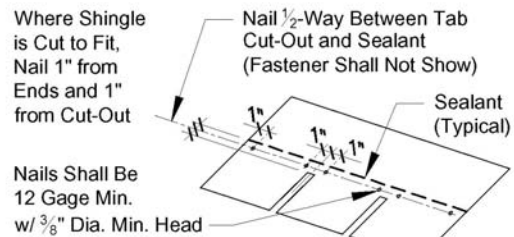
Upgrade of Structural Plywood Sheathing for Houses with Asphalt Shingle Roofing
